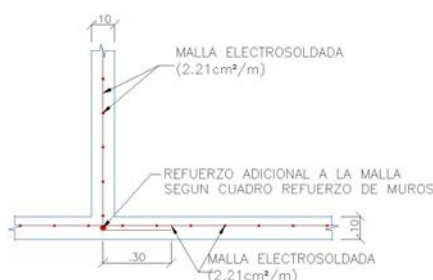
Additional reinforcement in shear walls intersection (plan). Photo courtesy of Alvaro P
